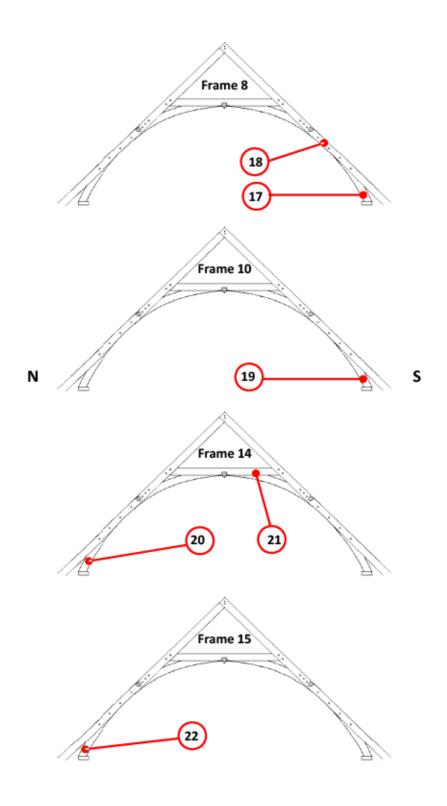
The nave roof trusses to show sampled timbers (after Baart Harries Newall, Architects, Shrewsbury)
